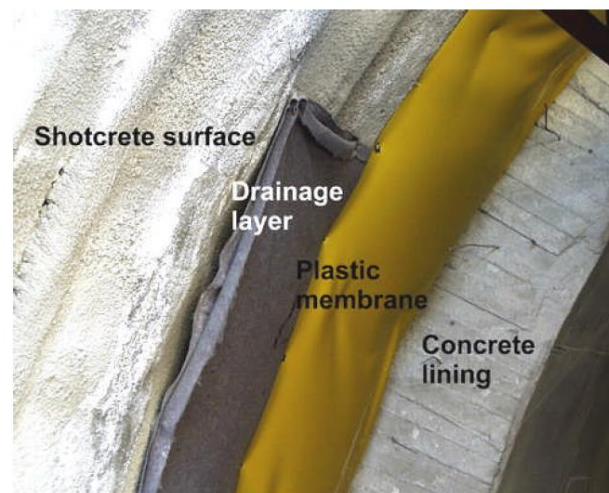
Construction of a complete tunnel lining consisting of an initial lining of lattice girders embedded in shotcrete, a geotextile drainage layer, a waterproof plastic membrane and a cast-in-place concrete final lining.
